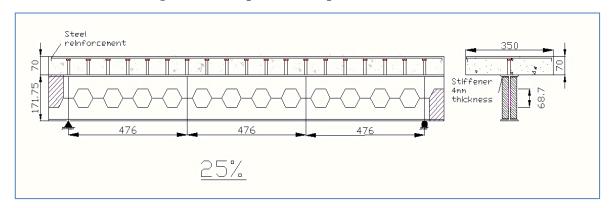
Plan of Composite Castellated Beam (λ =25%)
